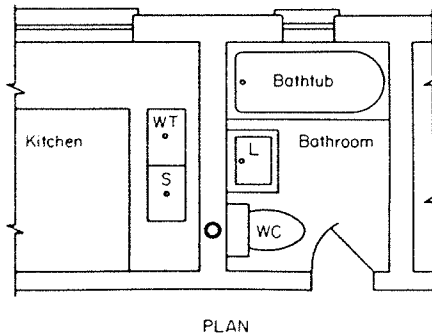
Typical sewage drainage system for one-family dwelling.
